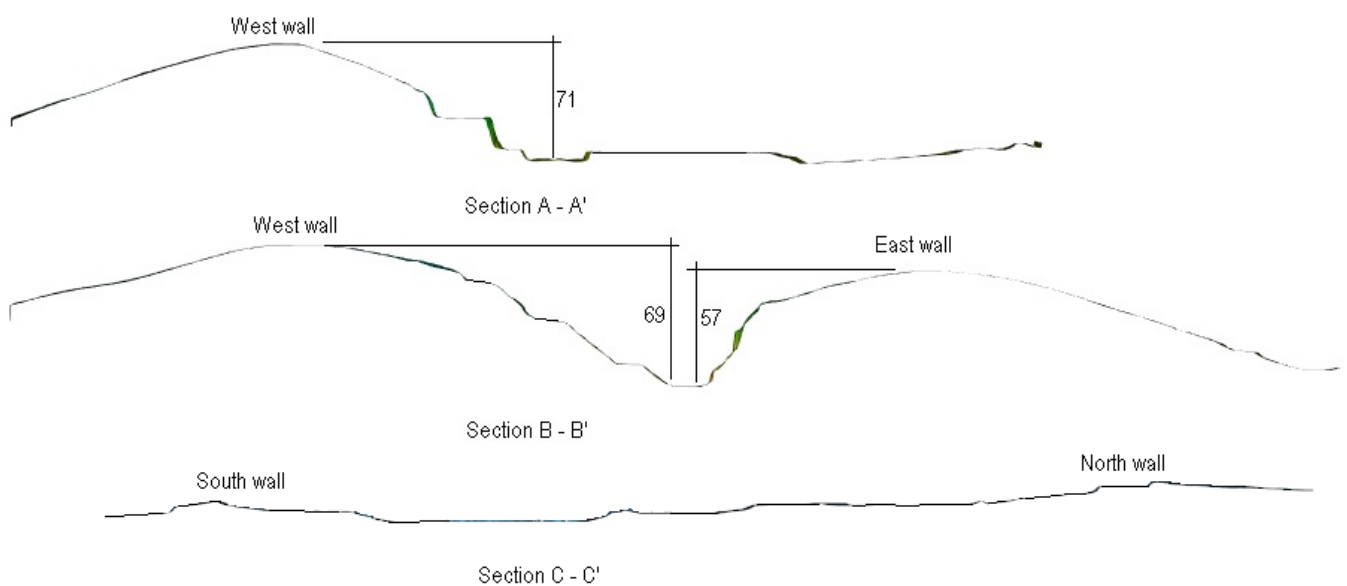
Cross-sections through the pit (Refer Figure 16). Cross-section B-B' is shown in Figure 2.
